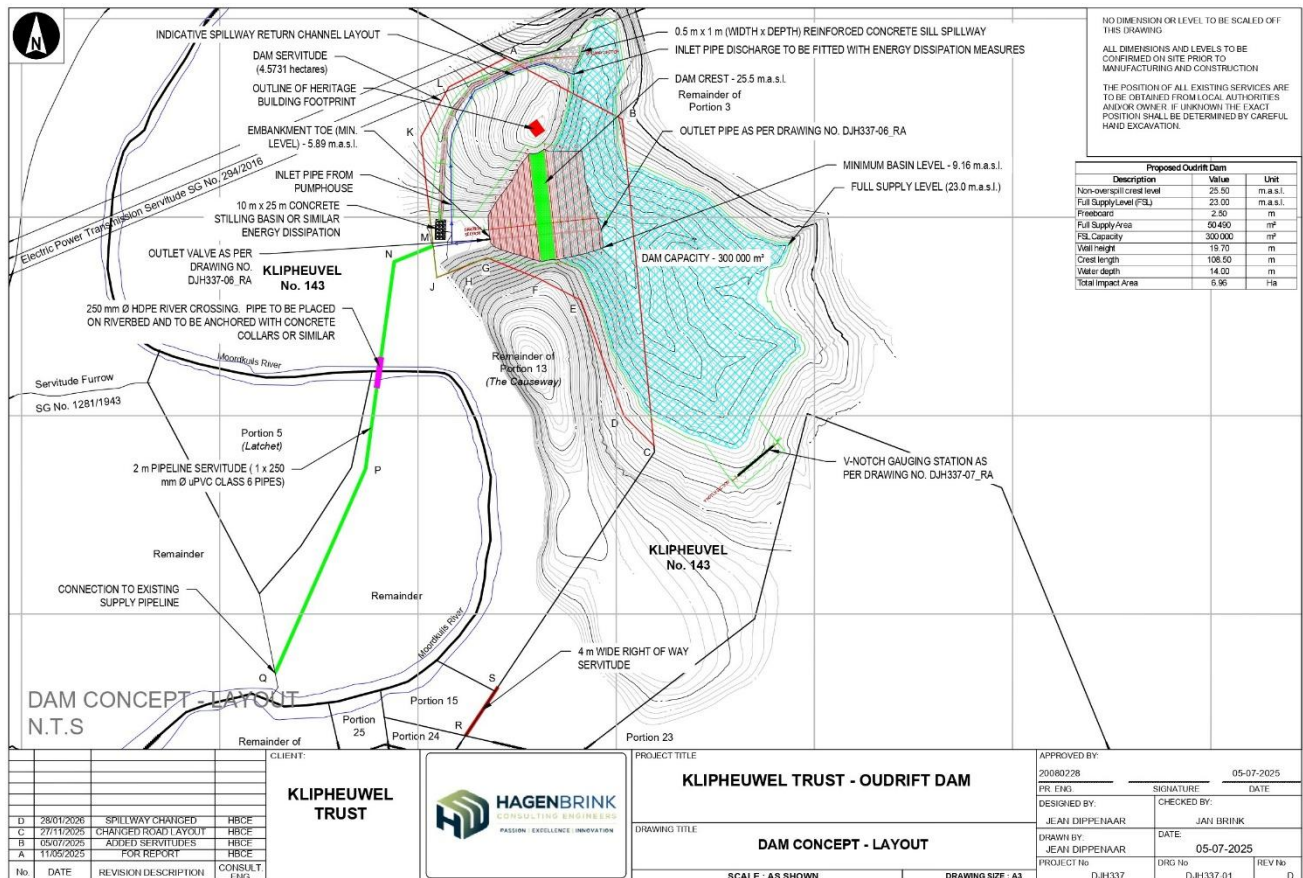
Proposed dam layout (preferred option) with smaller footprint.
